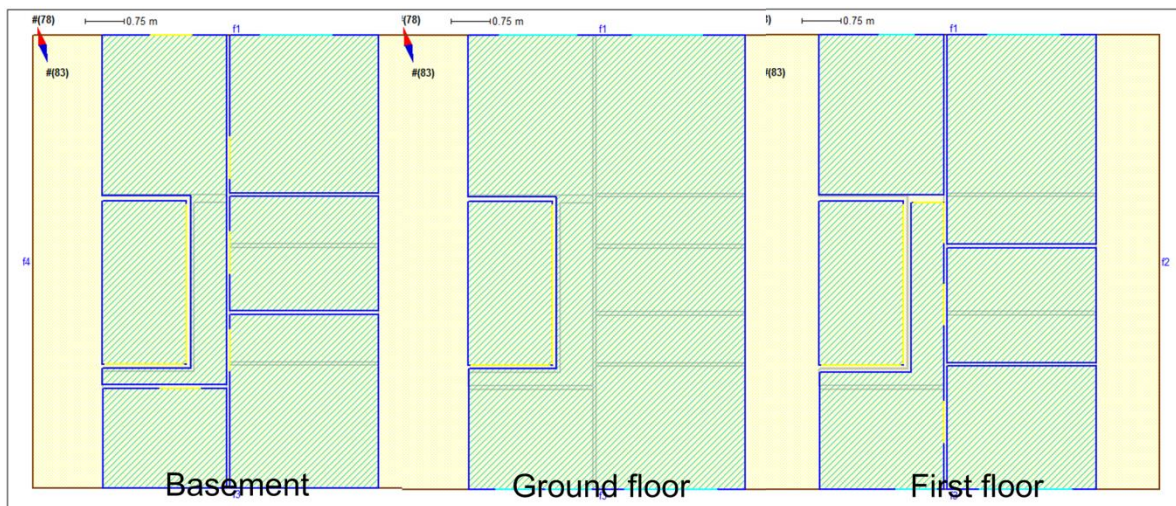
Floor layout of row House 2 and division into thermal zones.
